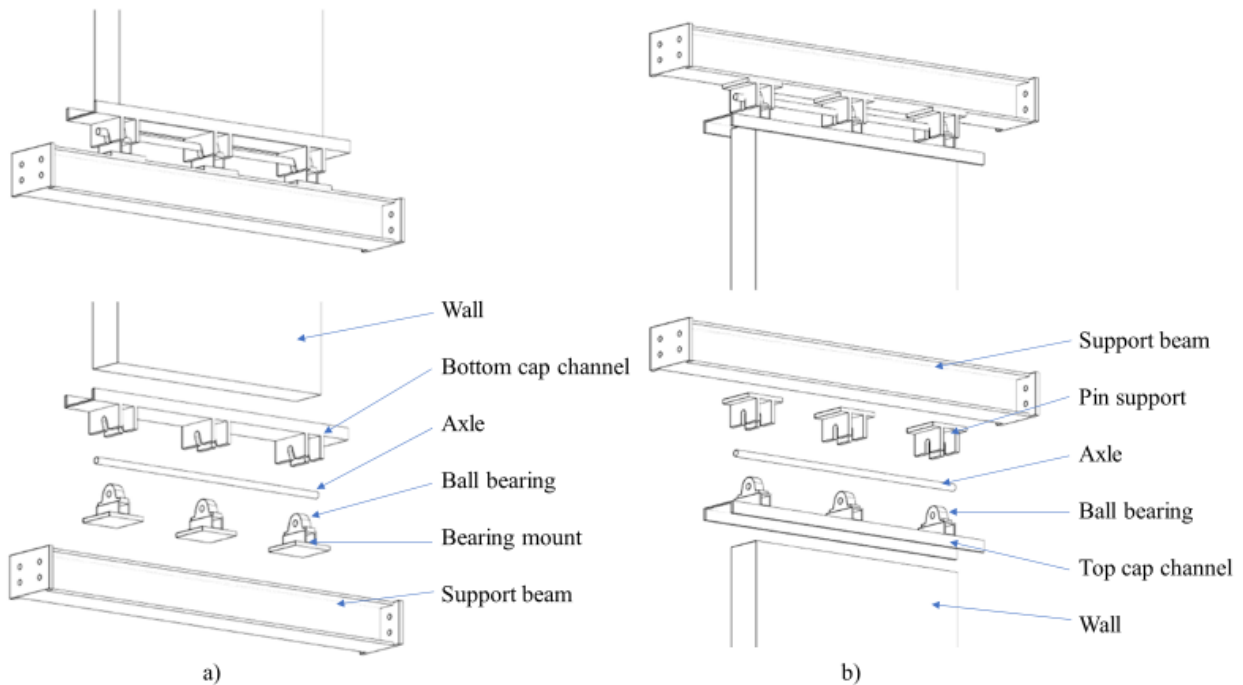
Detail of support connections using pillow-block bearings: a) Bottom support assembly and b) Top support assembly
